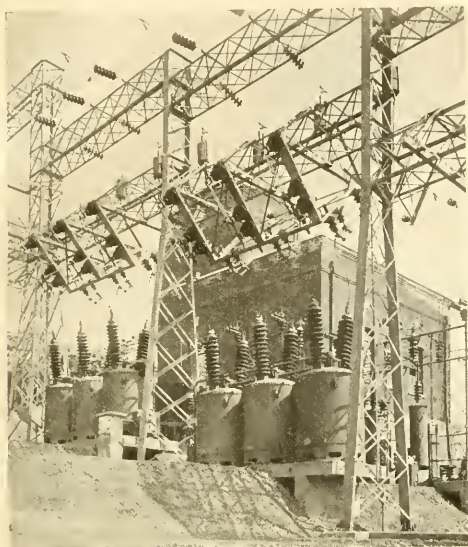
INSTALLATION OF 66 000 VOLT OIL AND DISCONNECTING SWITCHES AT DRAVOSBURG SUBSTATION
